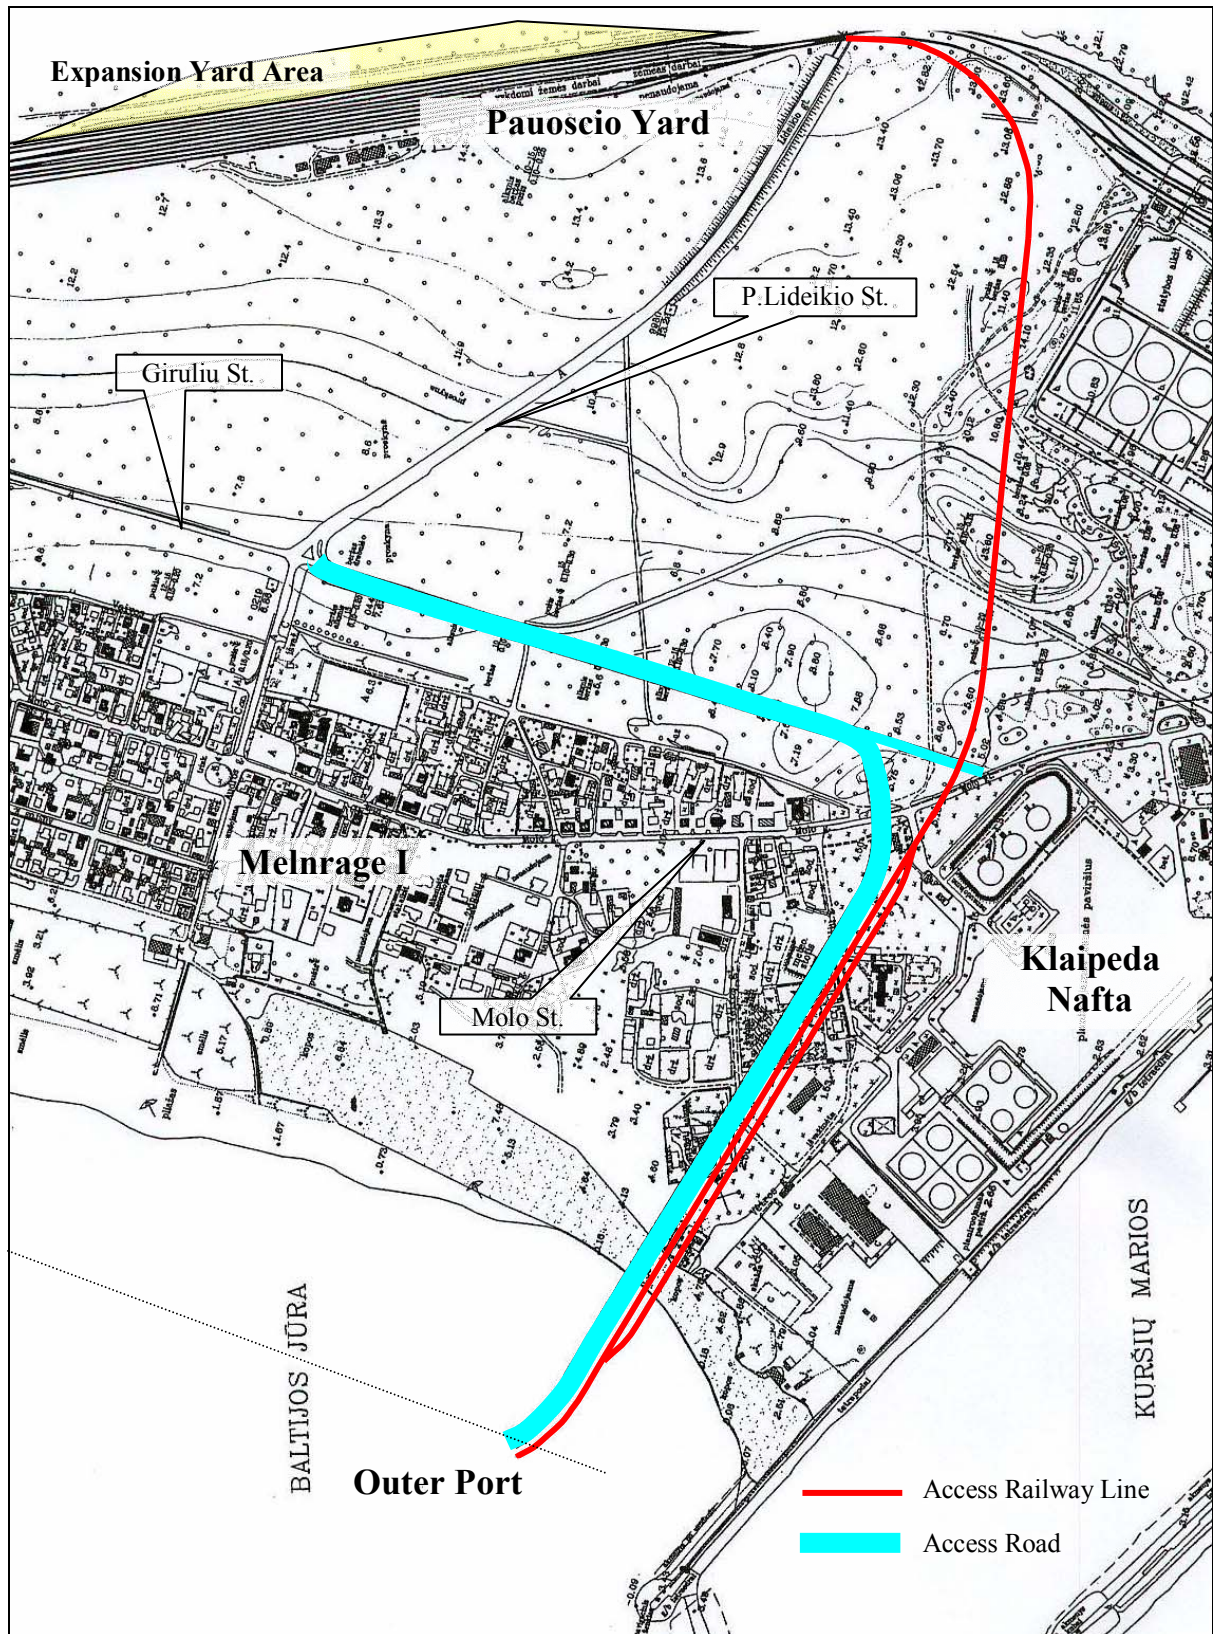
Location of Proposed Railway and Road to Outer Port
